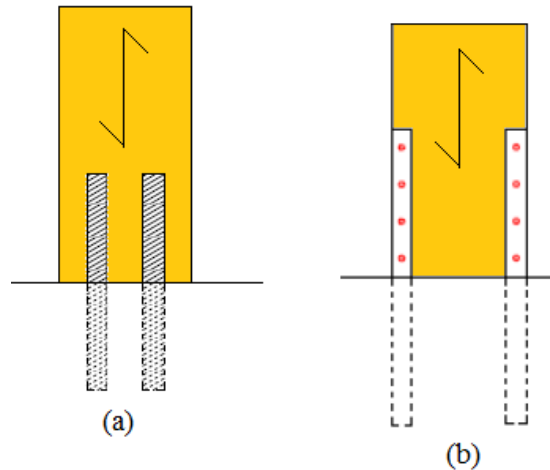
Moment rigid column-to-base connections with: (a) glued-in threaded bars and (b) external steel plates (Source: Kovanen, H. 2014)
